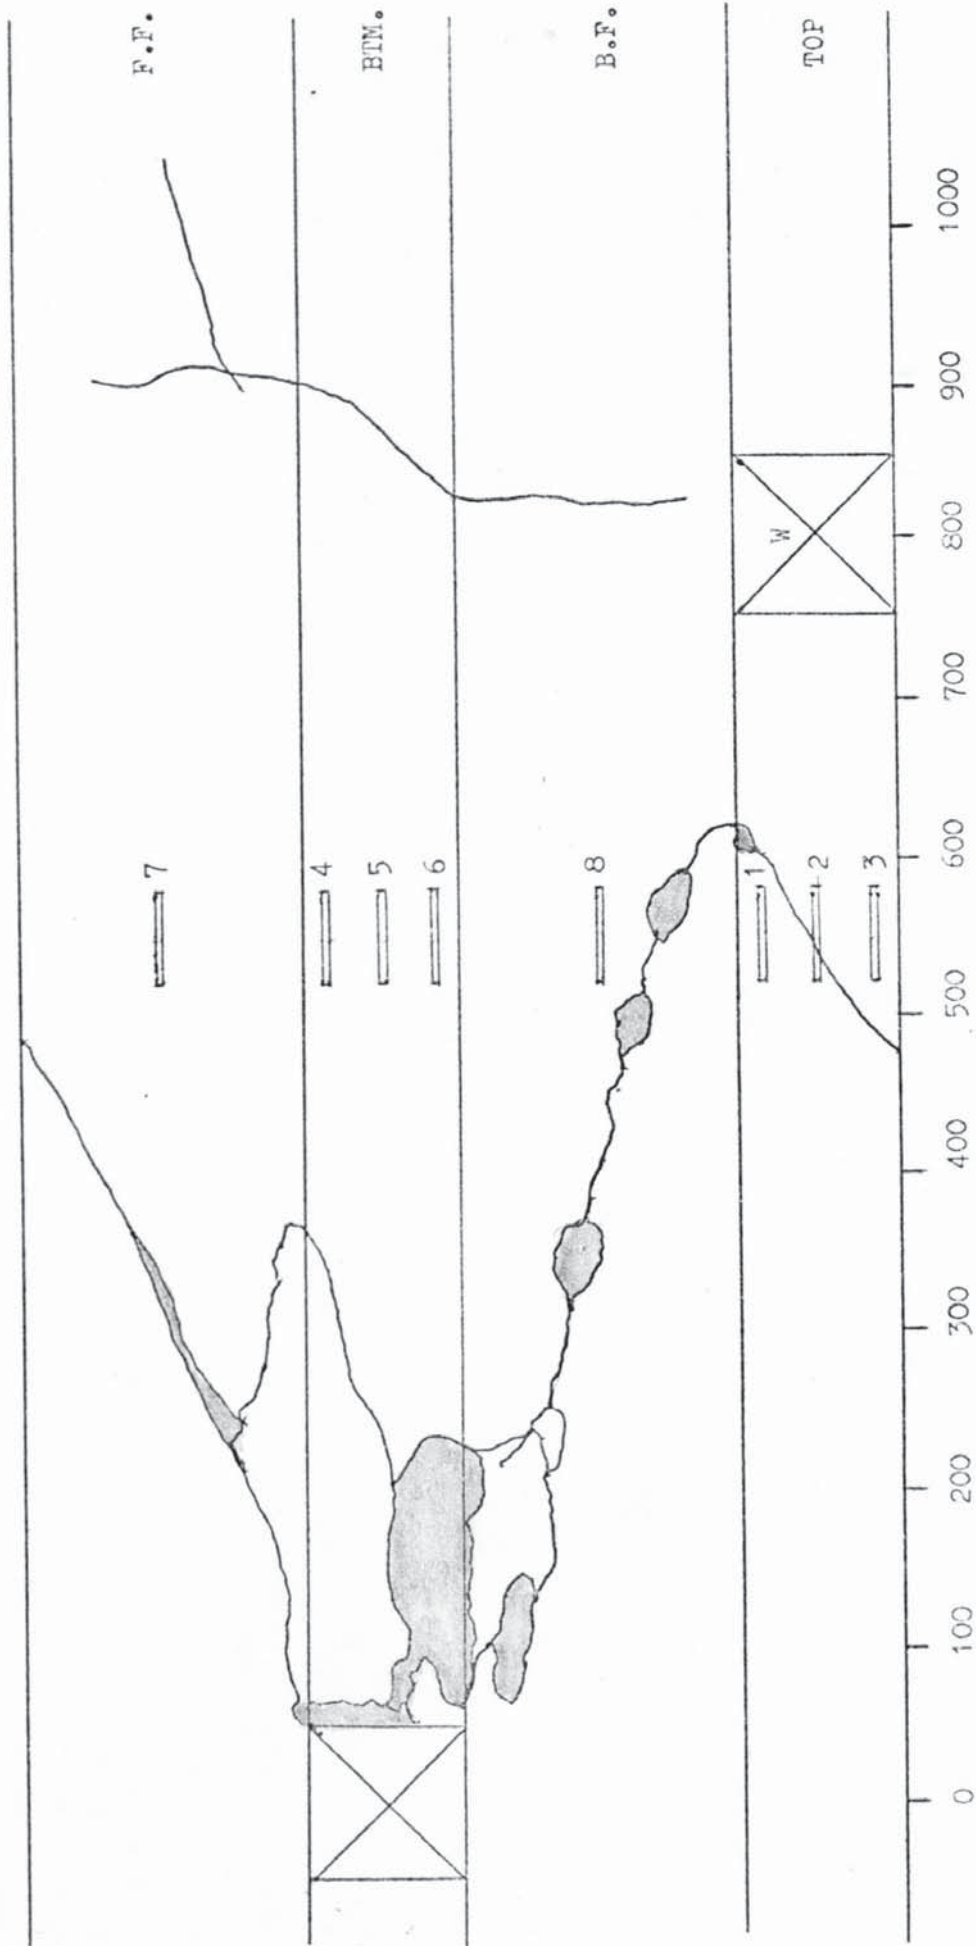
FAILURE CRACK PATTERNS - BEAM 6 (MODE 2)
